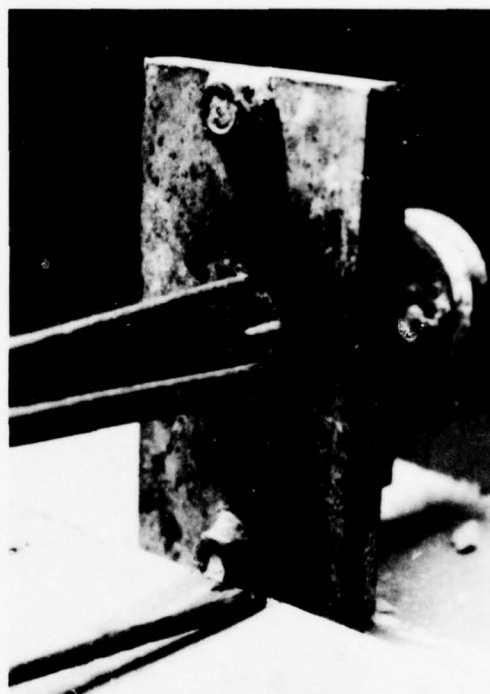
Edges of the landward end anchor of beam 13 lightly to moderately rusted. Note heavy rust to strands and broken strand just inside end plate
